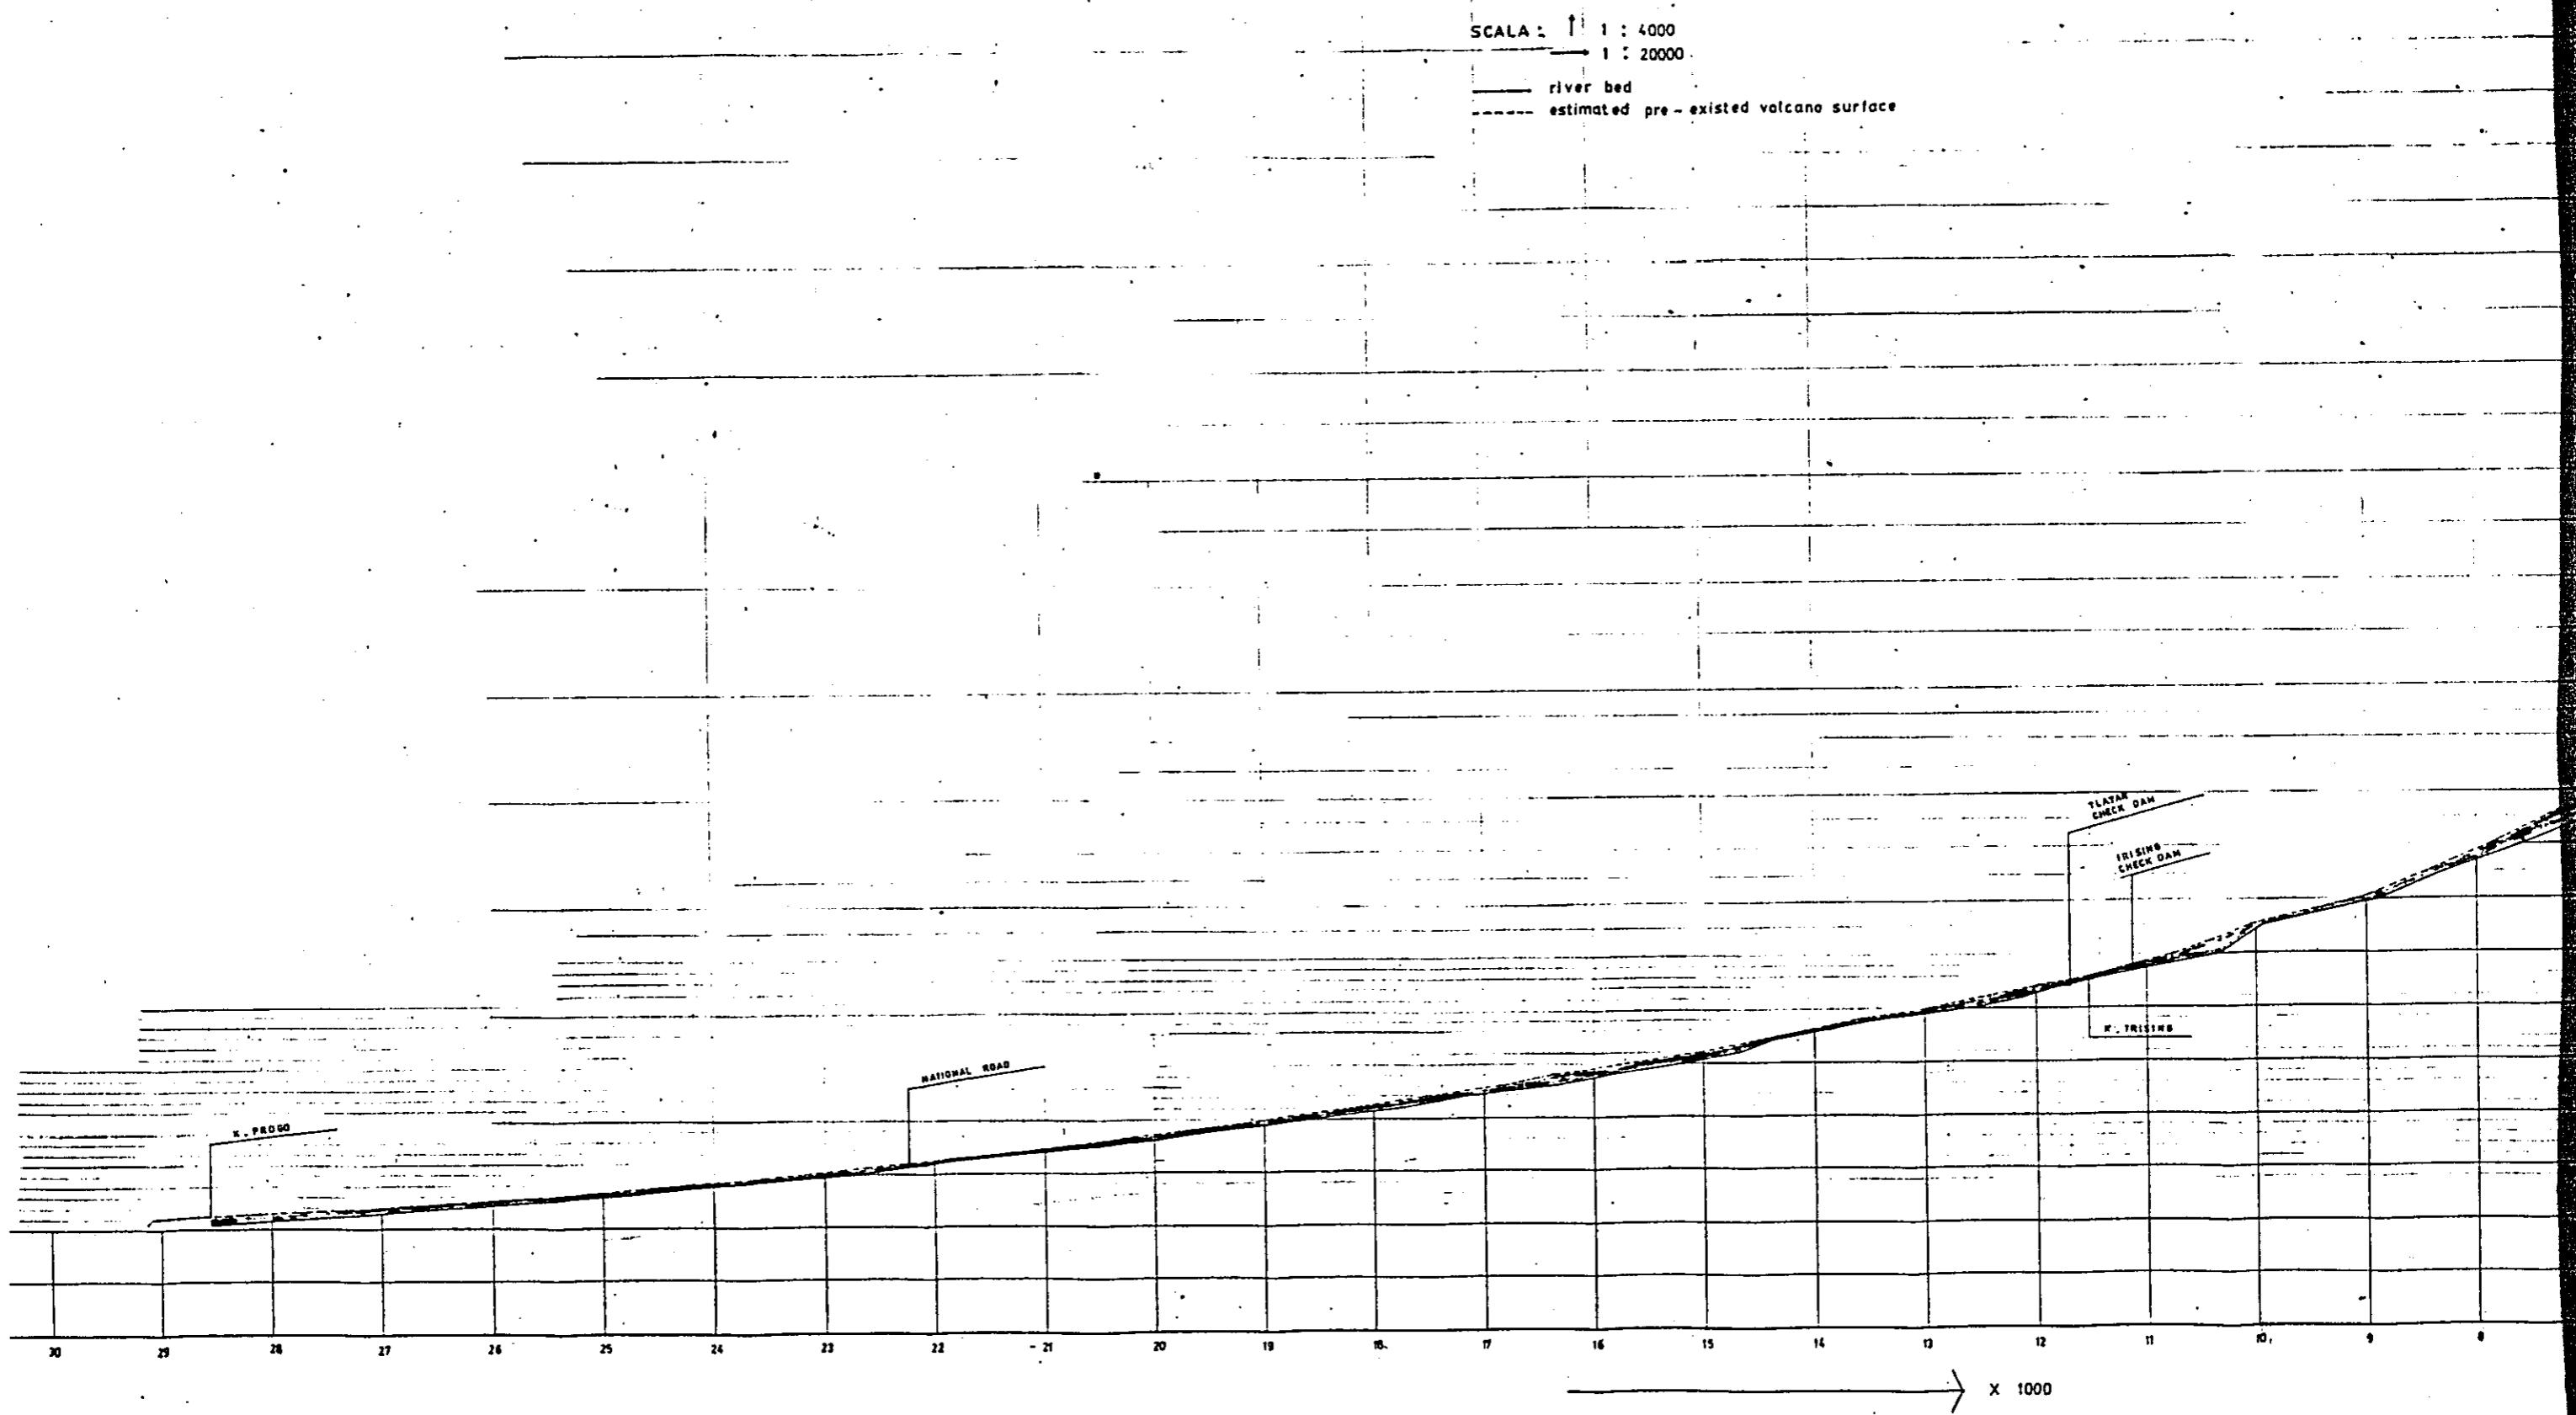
LONGITUDINAL PROFILE of K. PABELAN
